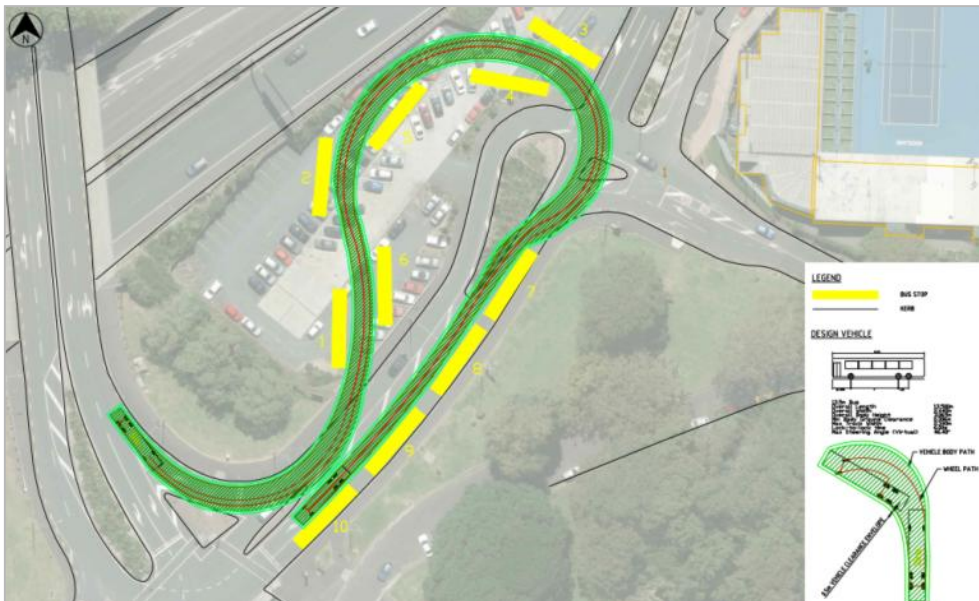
Site 4 - Bus tracking and possible layover spaces²⁸
